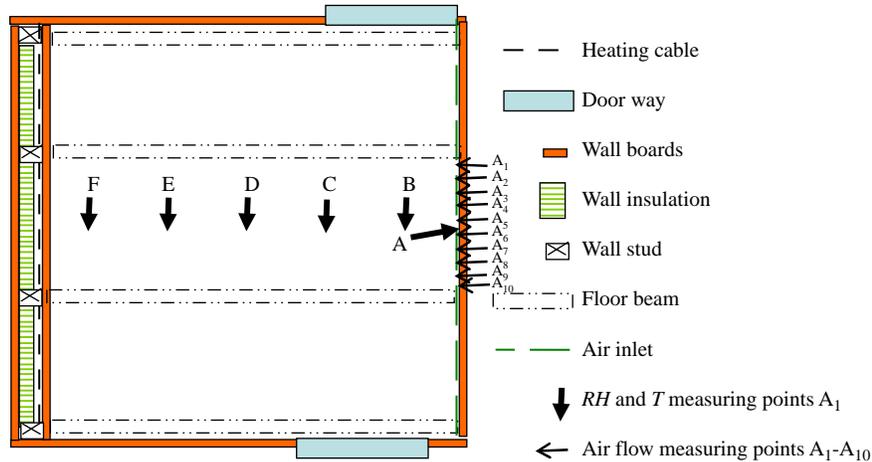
Schematic cross-section of an ordinary wall and bottom floor construction used in the extra *RH* studies, supplied with measurement points for *RH* and *T* in concrete slab and in floor
